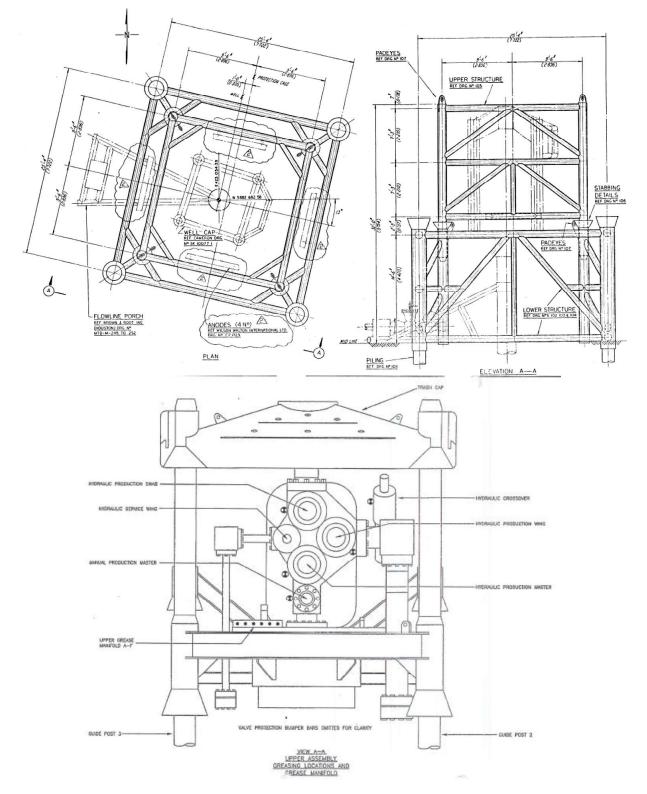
General Arrangement of Deborah 48/30-8 Wellhead Protection Structure and Xmas Tree
